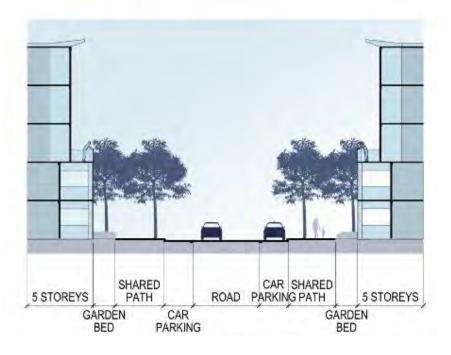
Indicative Daly Street (Main Street) Cross Section (source: EPCAD)
